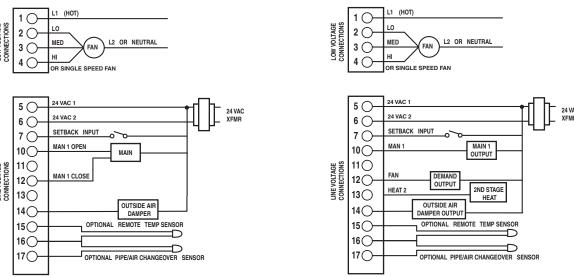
Typical Wiring for 3-Wire Valve Configuration (Two Pipe) Heating - Cooling With Changeover Pipe Thermostat (JP4 Jumper Installed).
